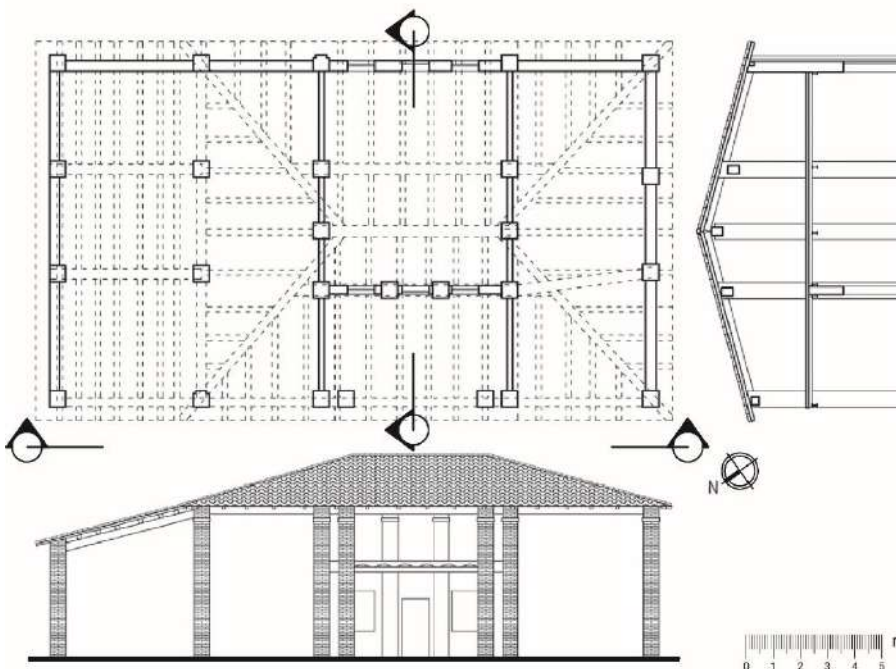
Survey of a barn type: plan, elevation, and cross section
